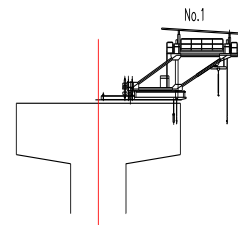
Crane Erection(SUPPER "T" GIRDER)
